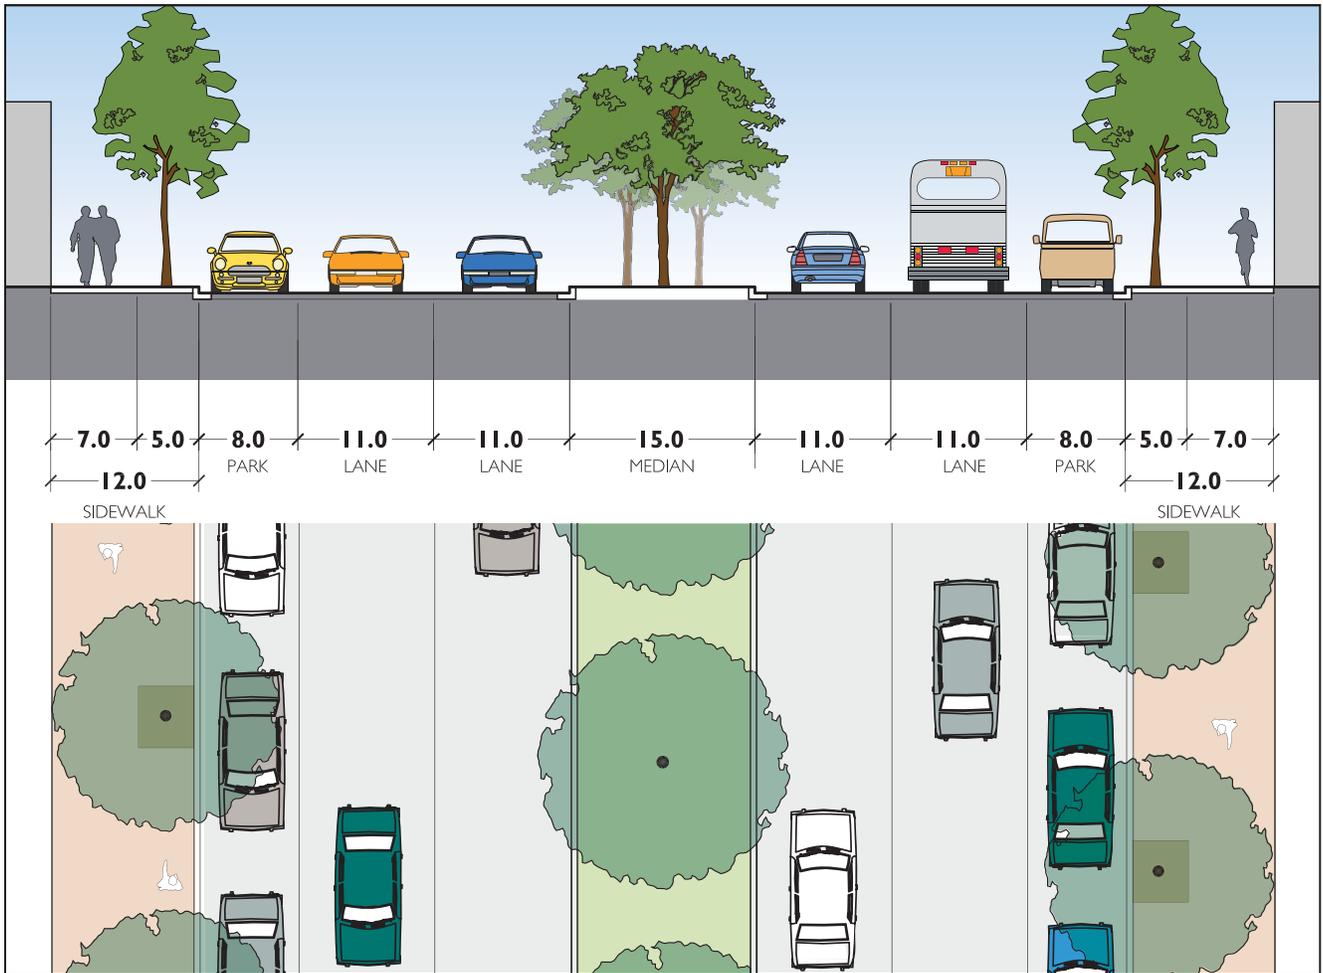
Proposed El Camino Real Street Cross-Section and Plan.
